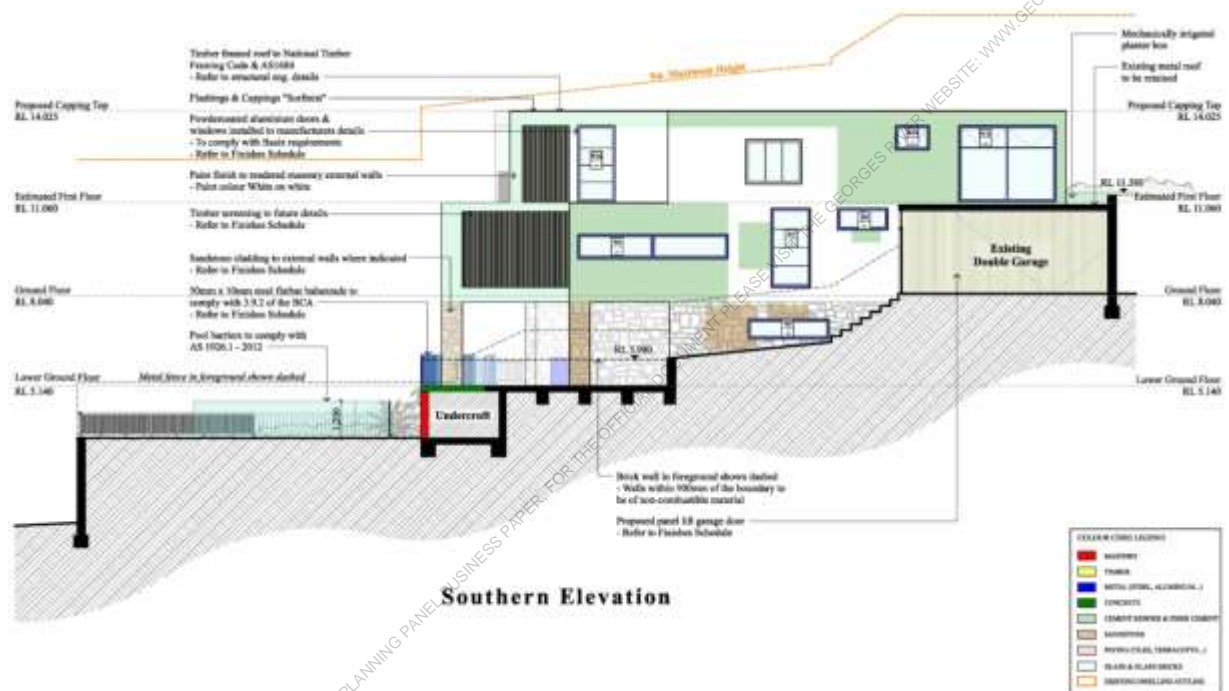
South Elevation (Source: Amended Architectural Plans, Graphio Am, Dated 20 January 2025)
